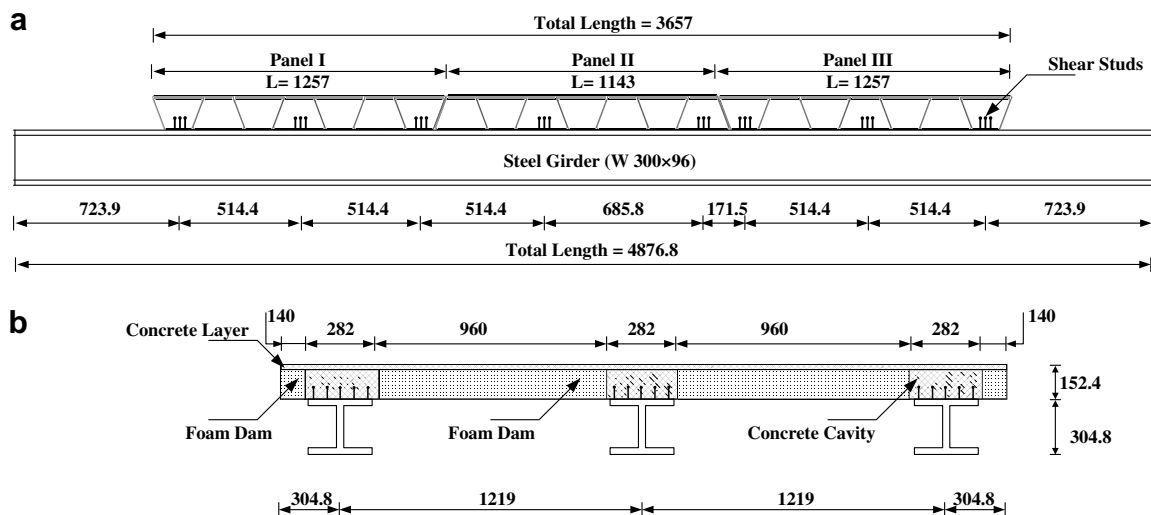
Shear stud configuration (units in mm) (a) elevation and (b) cross-section.
